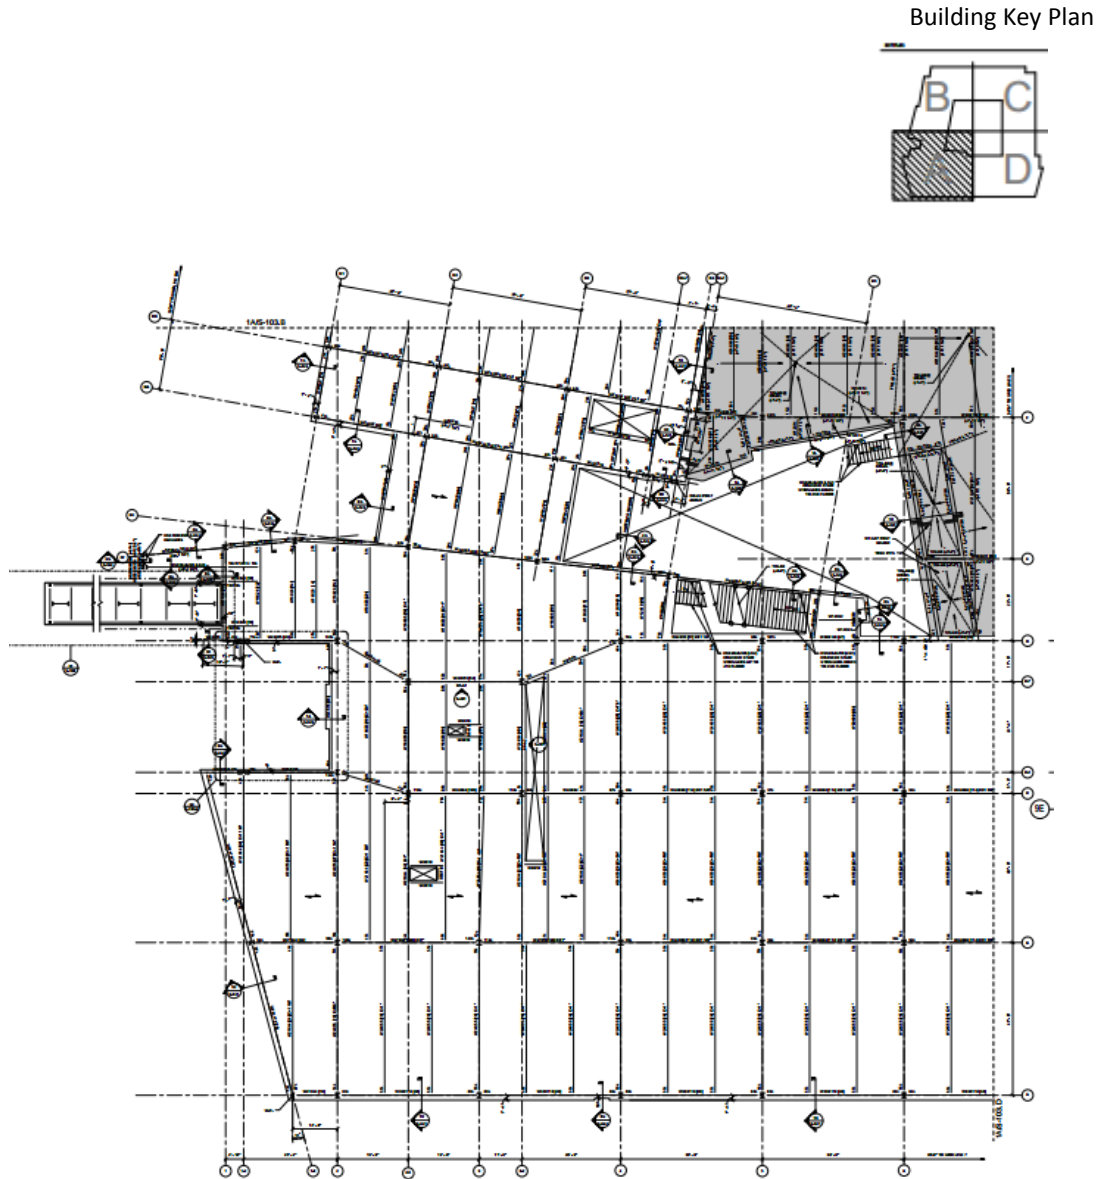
TYPICAL SEGMENT A FLOOR FRAMING PLAN
